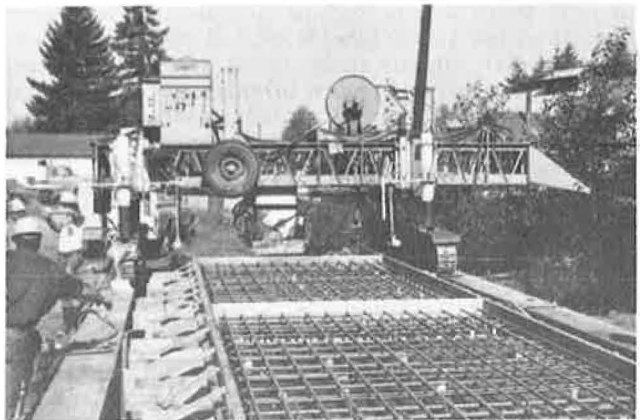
Gomaco 350 finishing machine in position at test slab 1.
